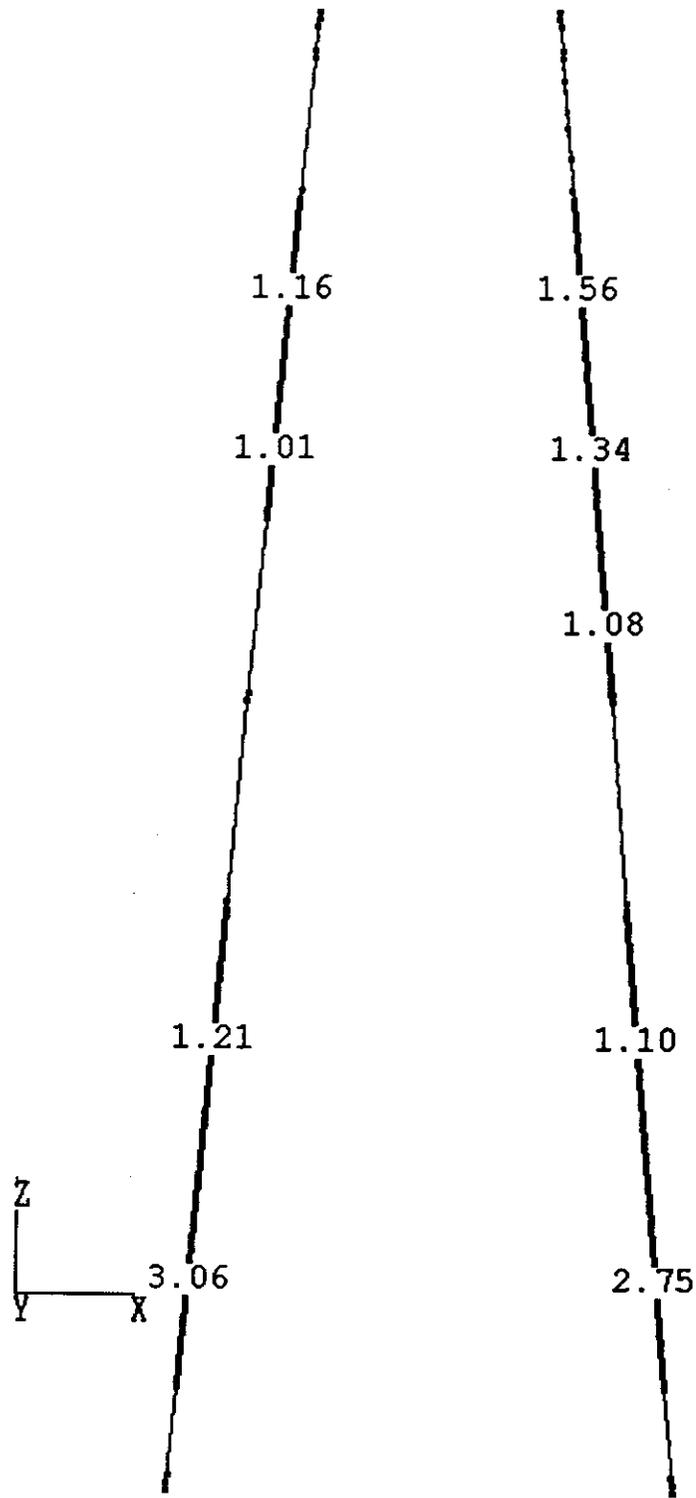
Benchmark Platform - Column Row 2 - Pile
